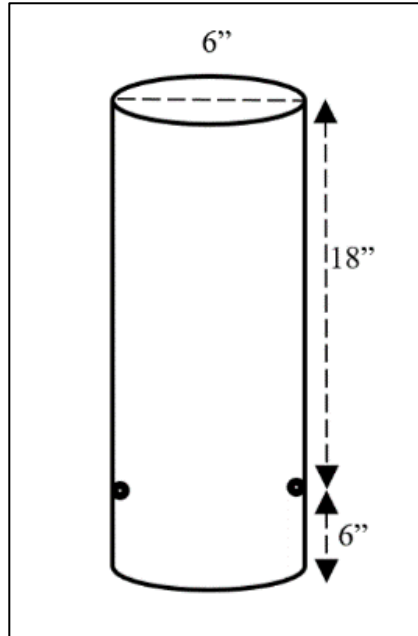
Schematic of the form along with the sensor location with dimensions in inches
